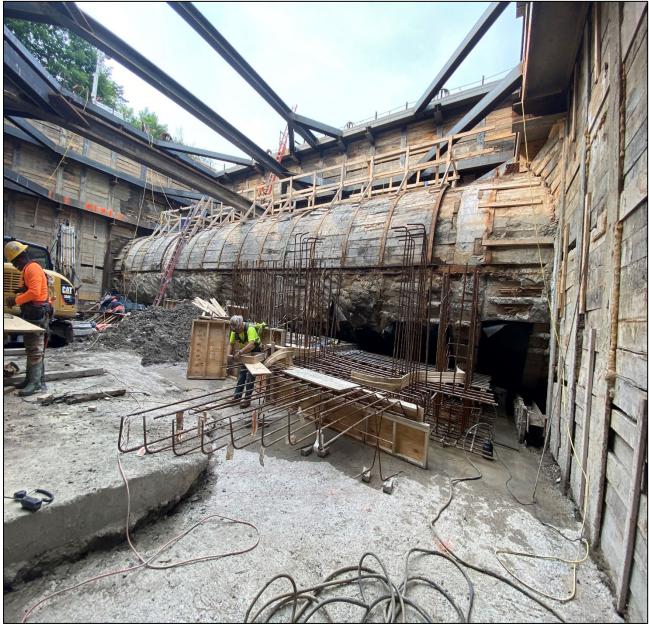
Tunnel Undermining @ West Wall of Beaconsfield Shaft
